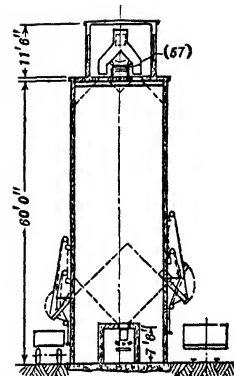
Car- and truck-loading silos; plant of Fig. 76.
